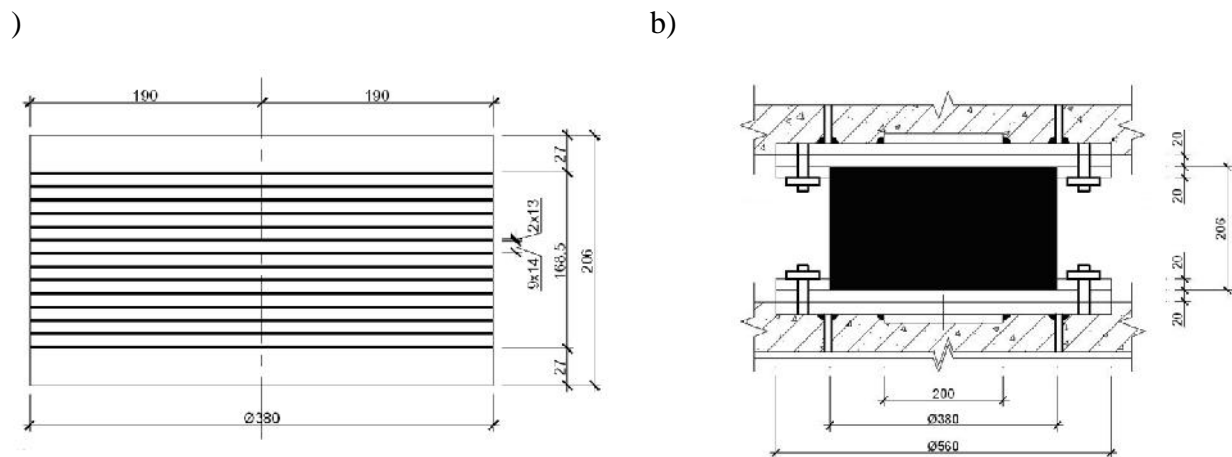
Seismic isolation laminated rubber bearings (SILRB) are applied in Armenia – general view with its dimensions, b – connection with reinforce concrete structures
